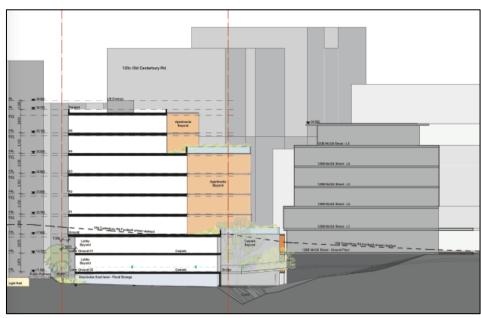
Indicative Section Through Building Massed to Old Canterbury Rd
